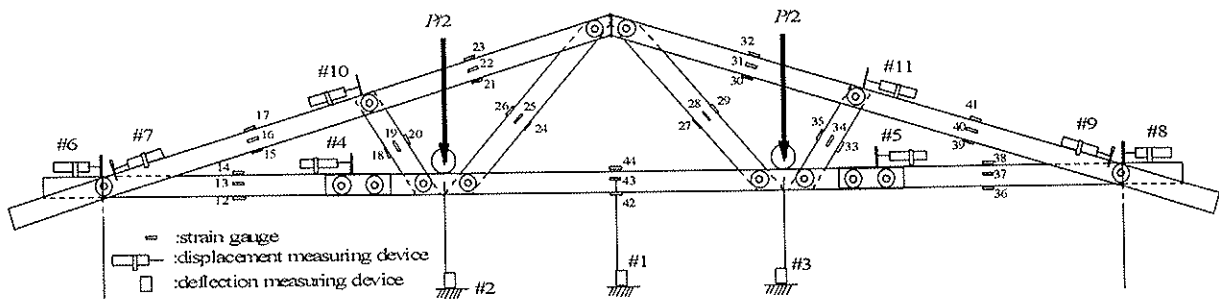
Test set-up for vertical two-points loading on bolted LVL trusses.
